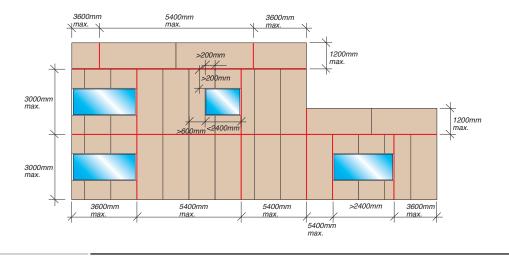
Typical Sheet Layout and Control Joint Spacing - Parapet Roof Construction
